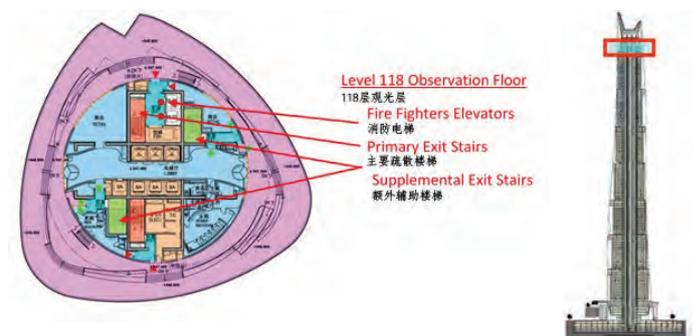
Evacuation observation floor. (Source: Floor plan courtesy of Gensler; Modeling courtesy of Rolf Jensen & Associates, Inc.)
